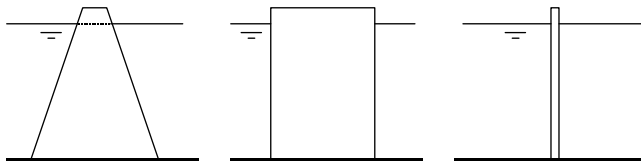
Types of dams: dam, caisson and vertical wall.
